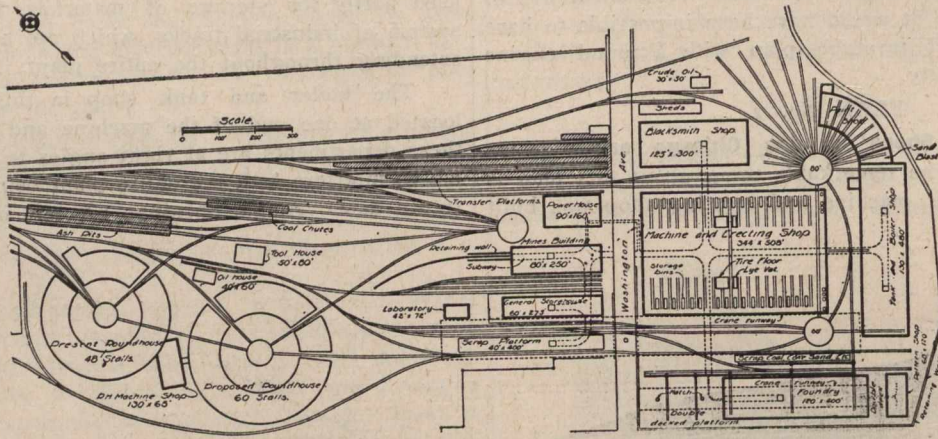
Proposed Arrangement of New Shops. Superseded by Later Layout as indicated in Fig. 13. Arrangement "A." Plan No. 6.
